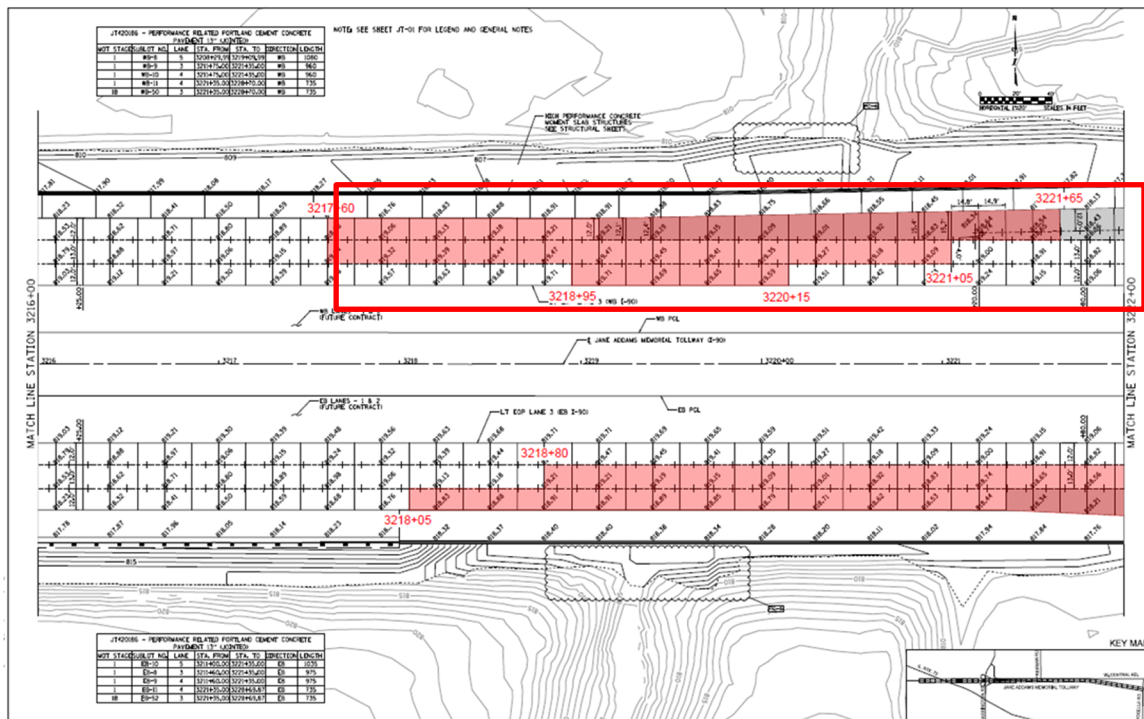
Failure locations next to Retaining Wall #1.
